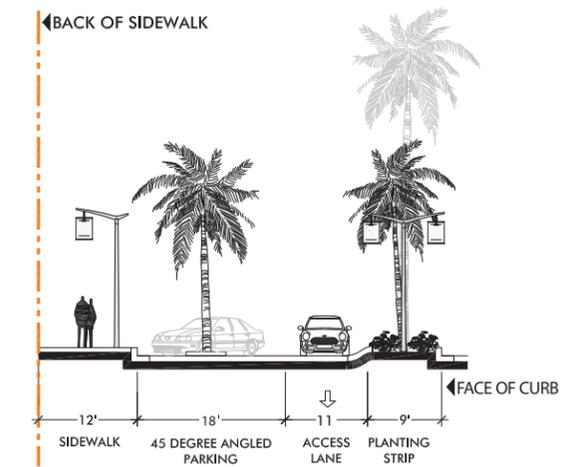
5)b)Neighborhood Center Streetfront with Access Lane Public Frontage
